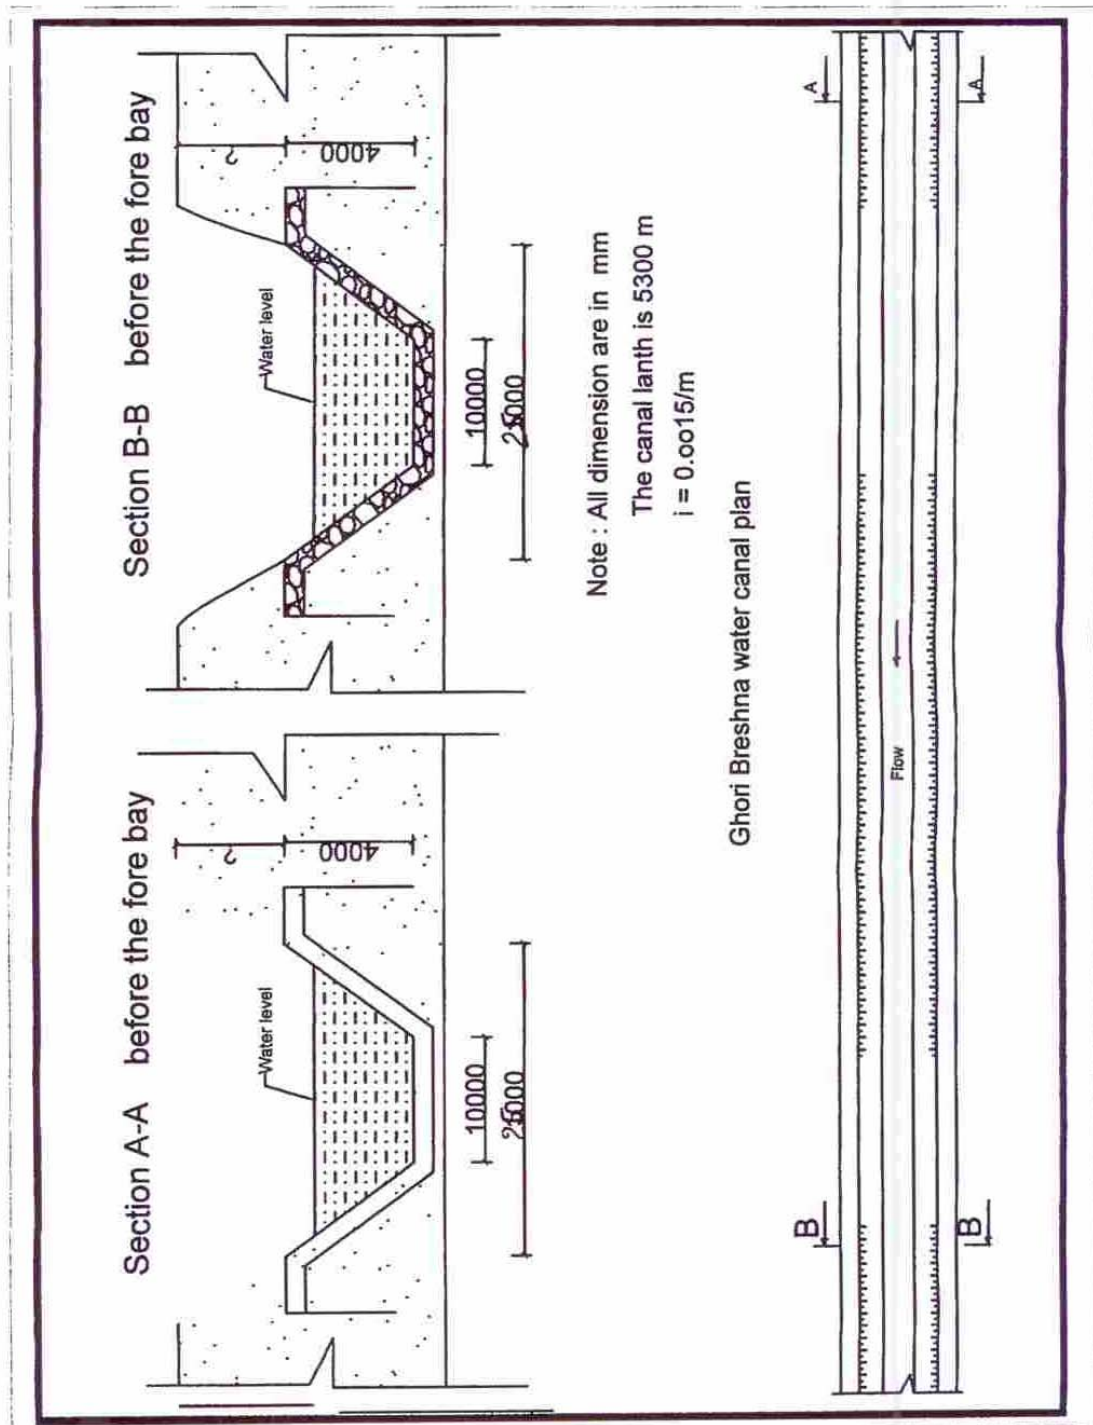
TYPICAL GHORī BRESHNA WATER CANAL PLAN
